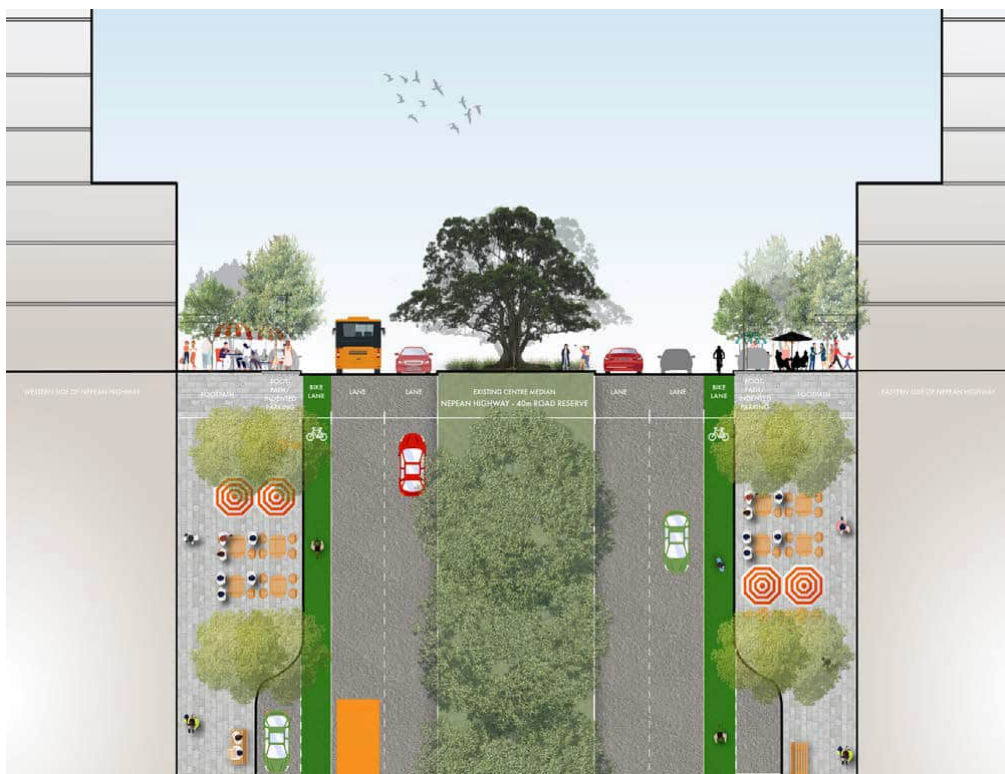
Example plan and cross section showing how Nepean Highway could be transformed.
